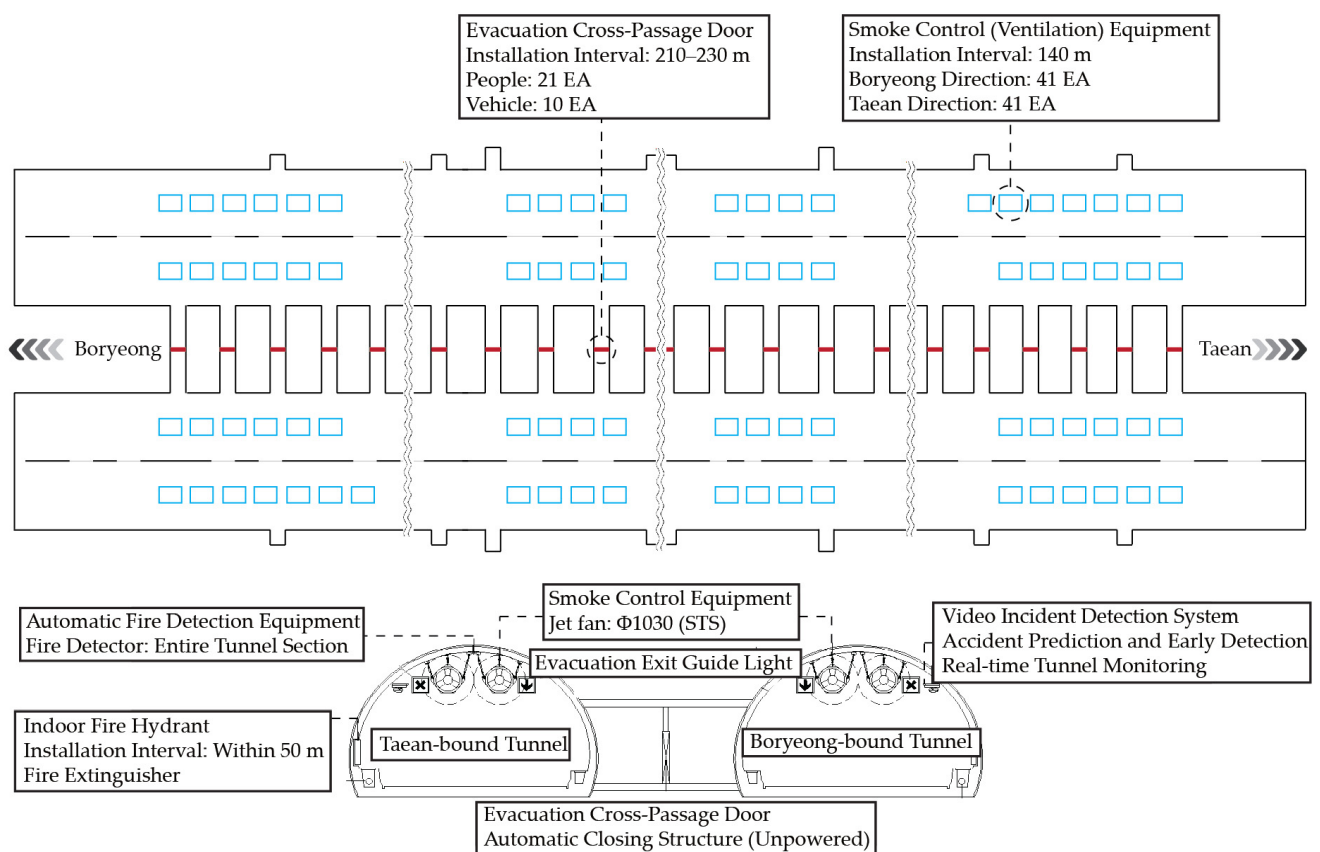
Overview of major facility installation and longitudinal profile of Boryeong Subsea Tunnel.
